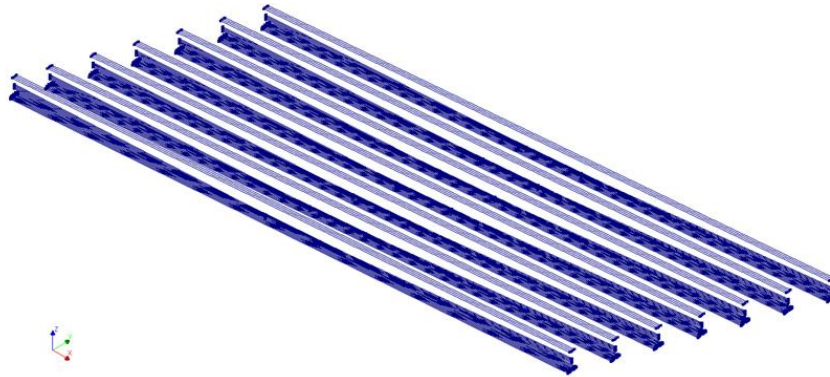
Isometric view showing prestressed strands in Span 1 girders.
